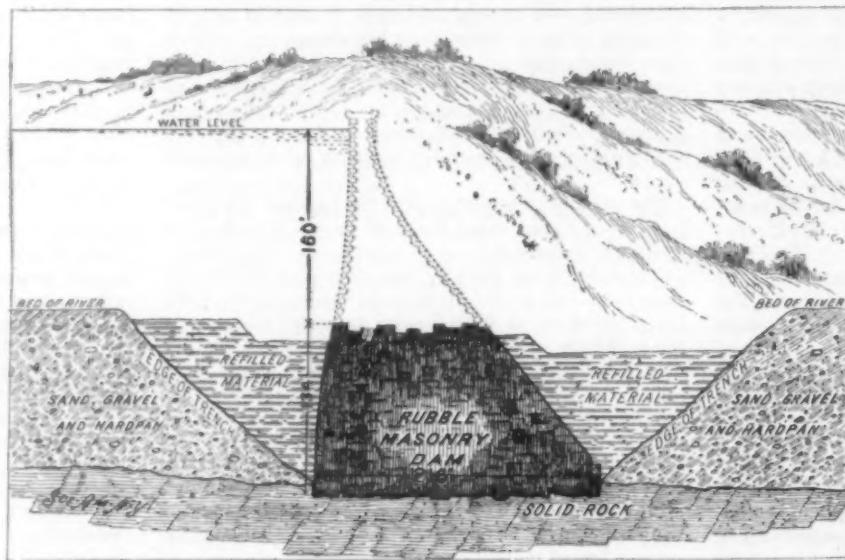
Section Through Croton Dam, Showing the Excavation, Completed Masonry, and Refilled Material.
